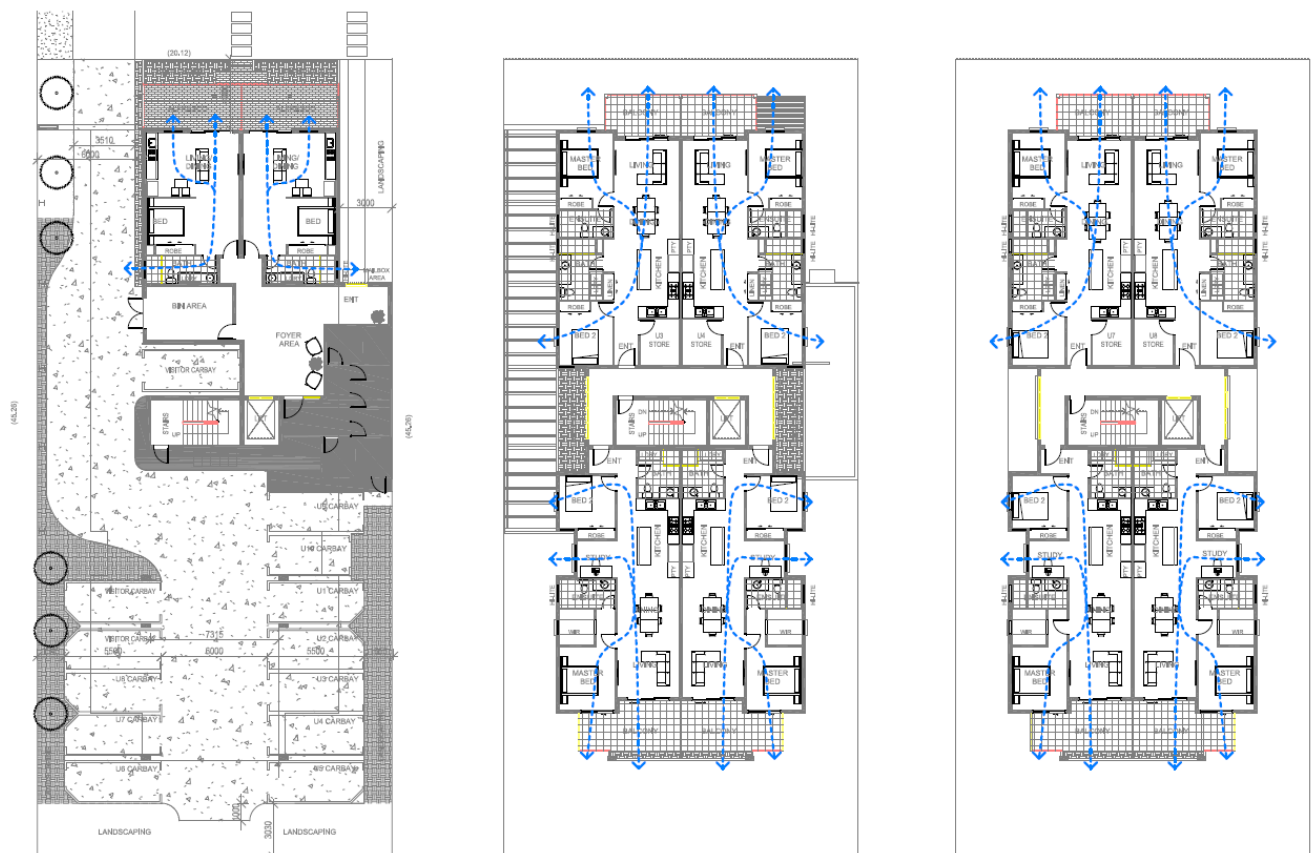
Eight out of a total of ten apartments (80%) in the above can achieve natural cross ventilation with dual aspects /corner layout.
